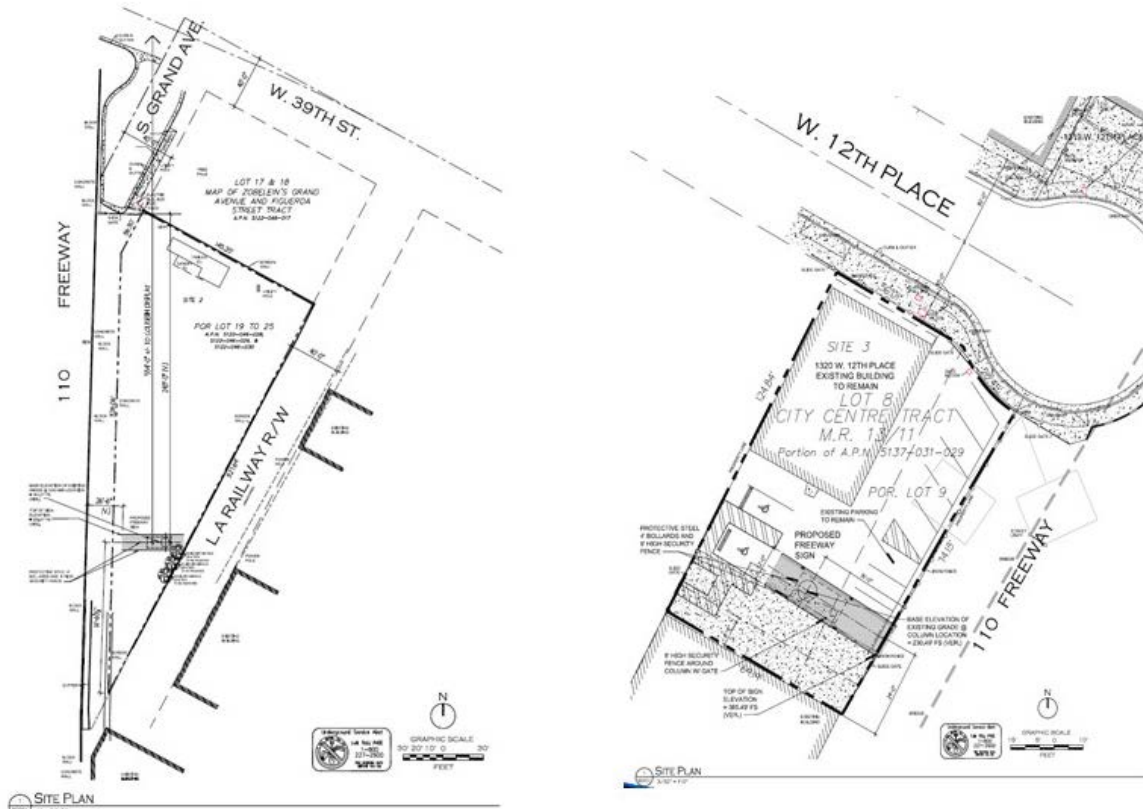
Proposed Grand Avenue and 12th Place Site Plan
